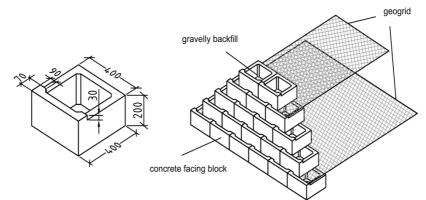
Wall from small prefabricated blocks with a detail of typical block
